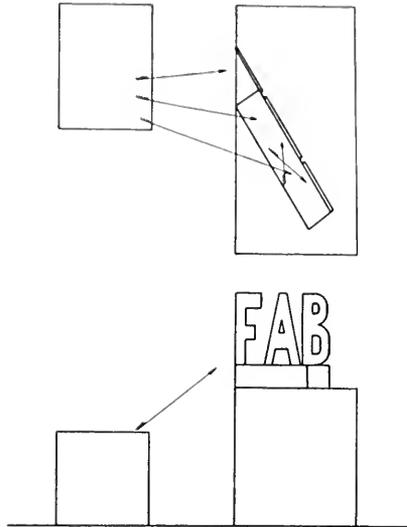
Plan and Elevation of Two Buildings on One of Which is Mounted an Advertising Sign with Letters 56 Ft. High Floodlighted from Stations at the Base of the Sign and on the Top of the Other Building
